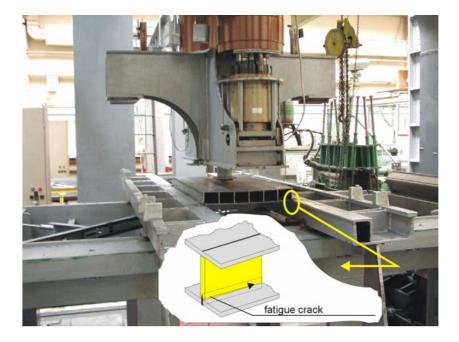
specimen B: test set up and failure mode.
